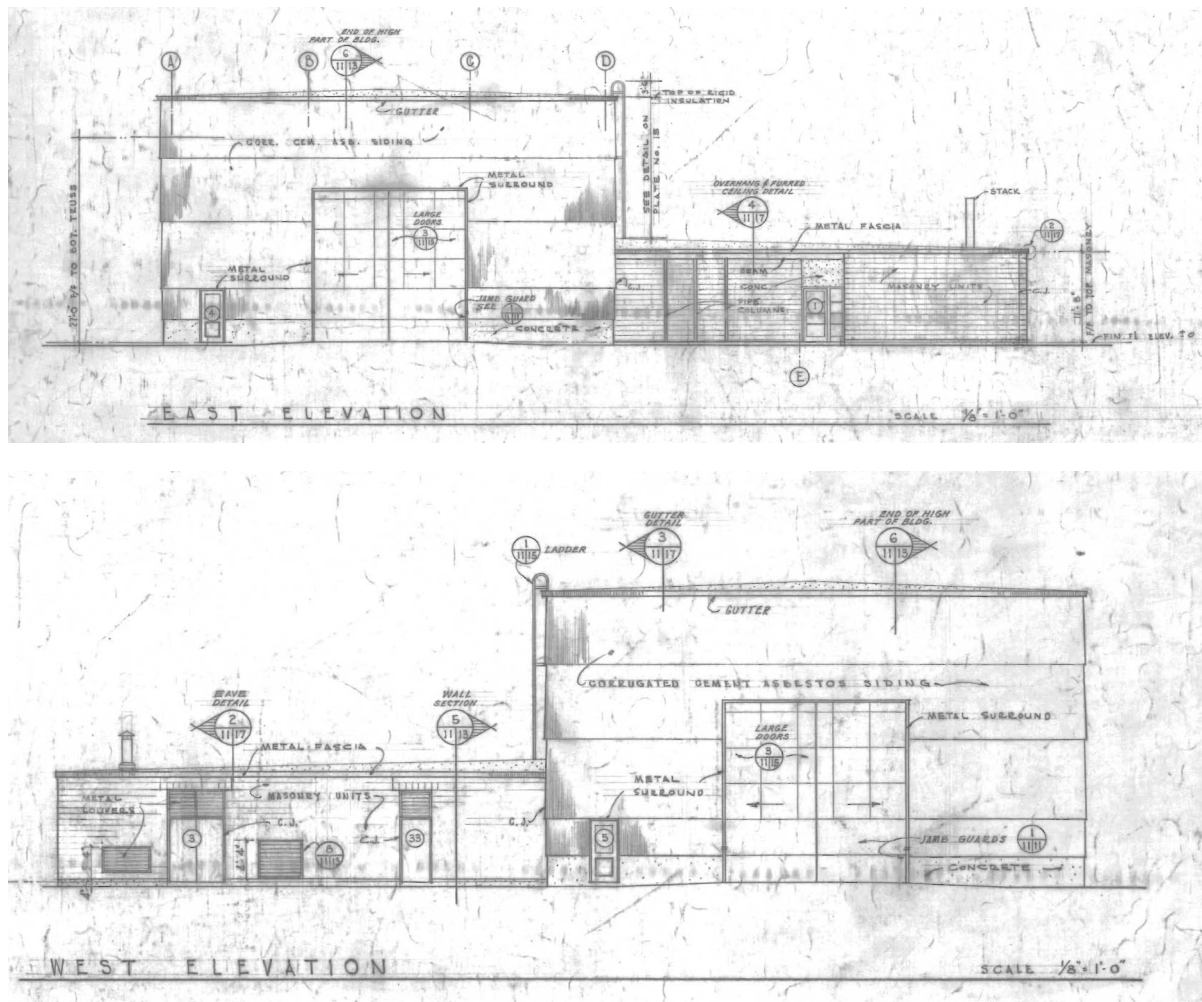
Property 23626, east and west elevations from 1958 WS-GZ plans.
